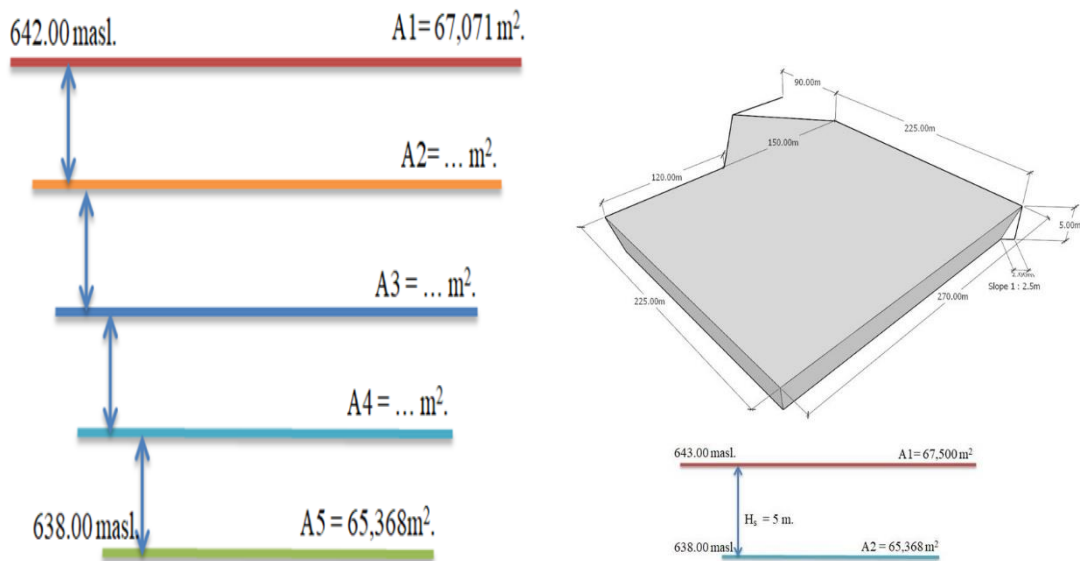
The Detail of New Reservoir Area and Soil to Excavates
